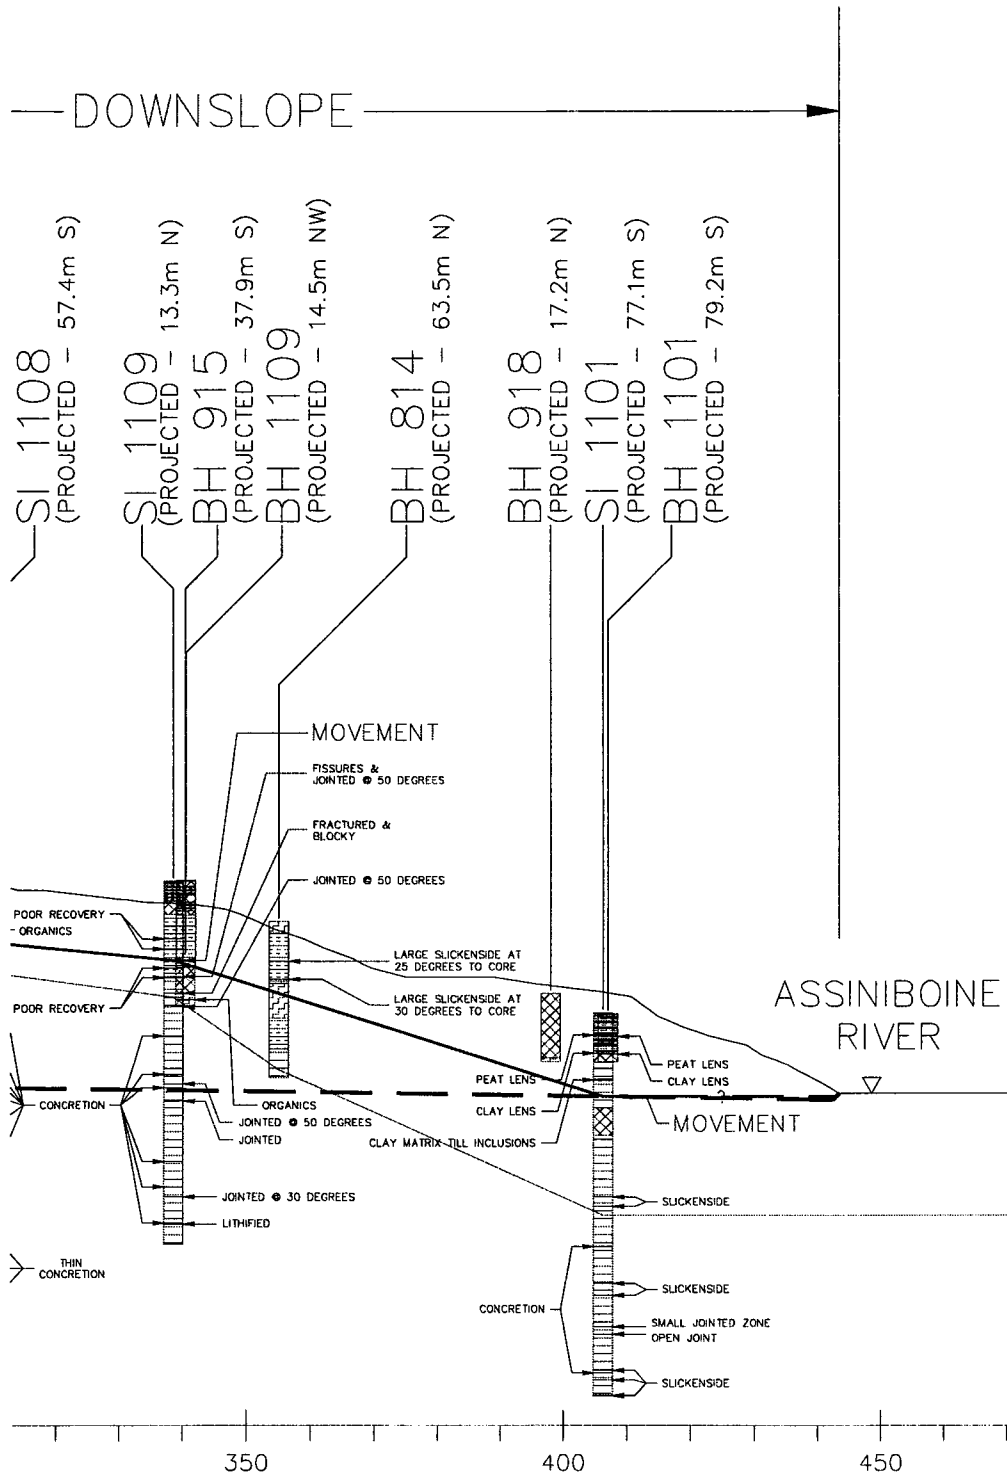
Enlarged section locating possible shear surfaces (cont.).
